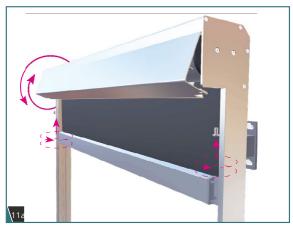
Mounting application in the case of: Zipner 90, Zipner 110. Unscrew and remove the inspection part of the cassette (two side screws at the bottom of the cassette).
